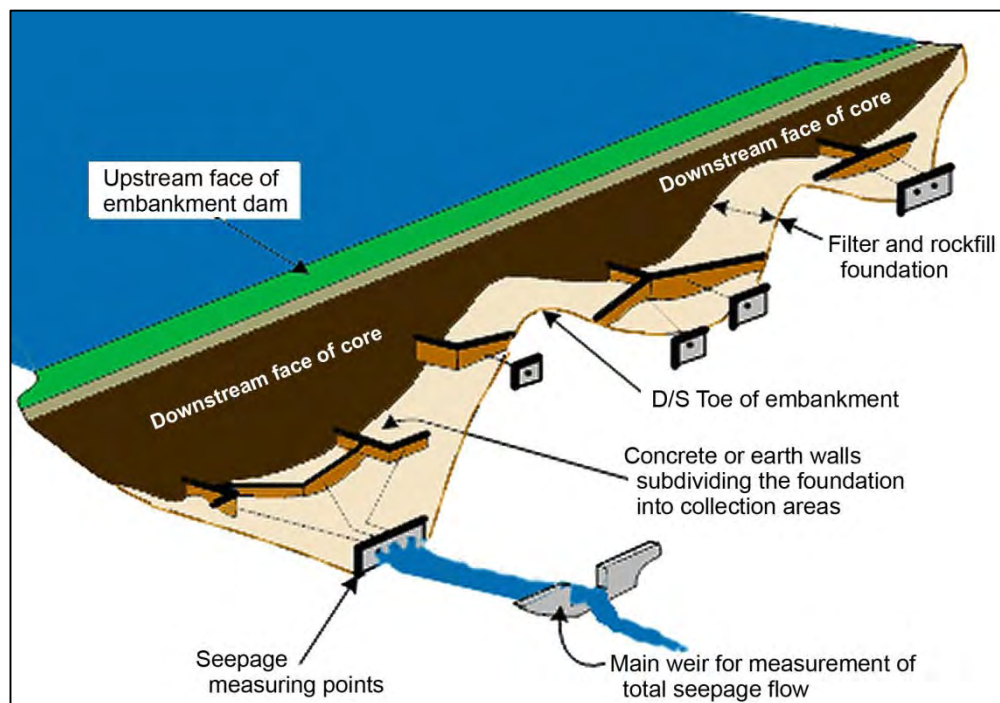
Illustrative seepage collection and measurement system installed on the foundation surface under the downstream shell of an embankment dam (after ANCOLD, 1983).
